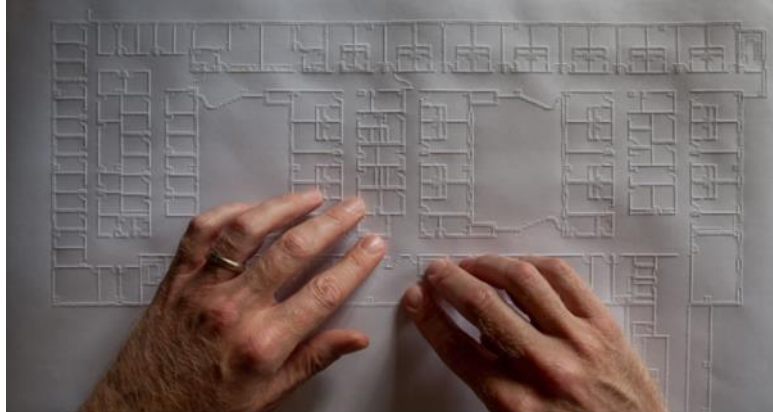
Prominent floor plan for blind and visually impaired users. (Photo by: Don Fogg)
